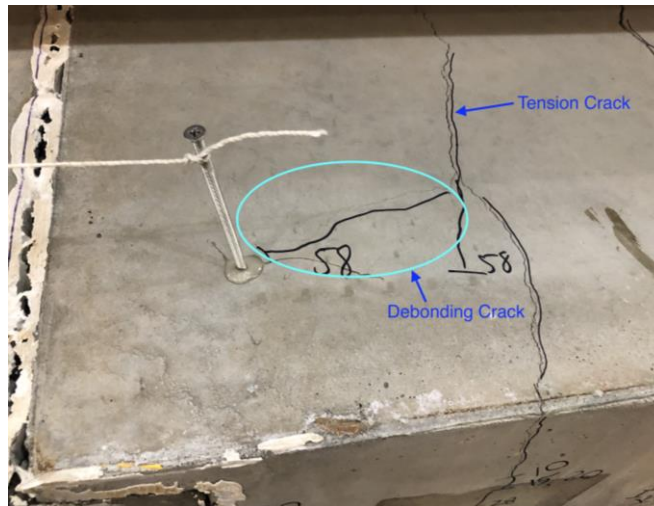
Photo. Large cracks along damaged shear key of precast concrete panel at failure.
